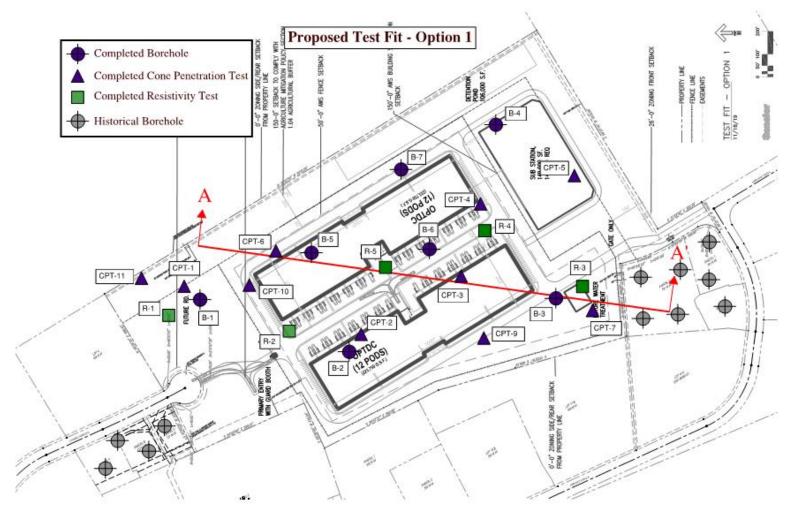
Geotechnical Exploration Plan for Proposed Test Fit – Option 1
